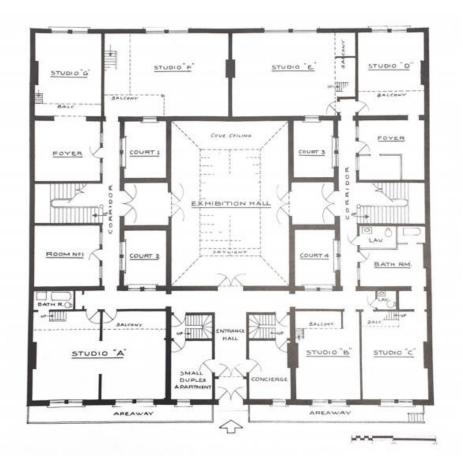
Tenth Street Studio Building Plan, Drawing by Alan Burnham.
